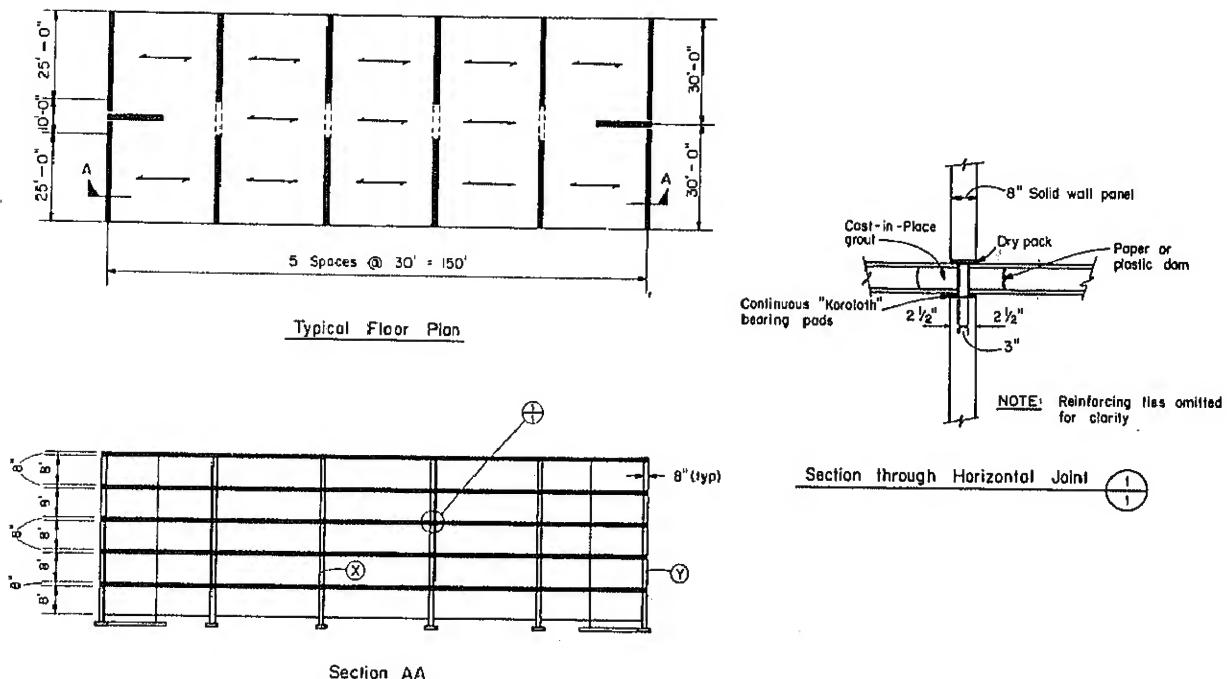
Plan and Sections Through a Typical Large Panel Building
